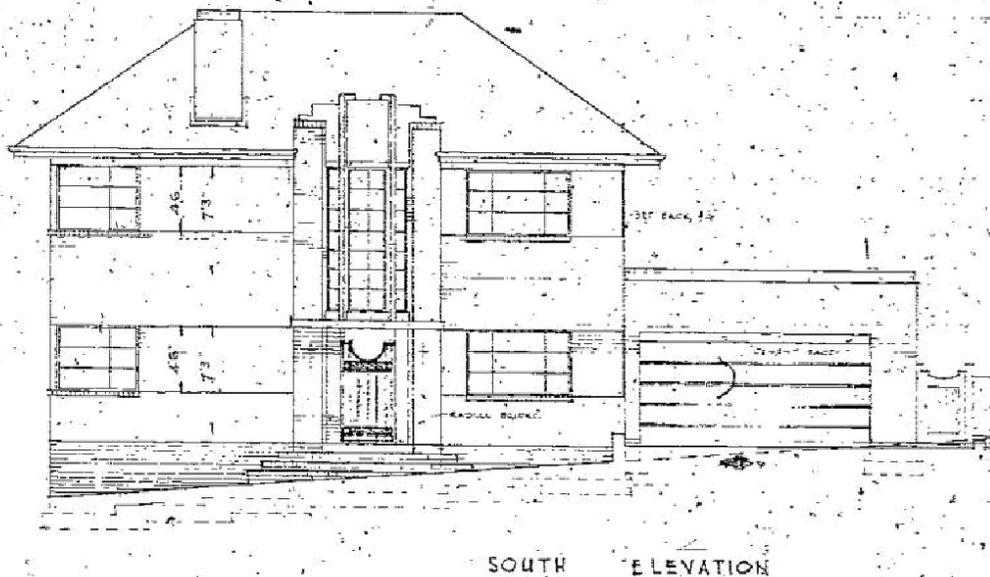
The south elevation, facing Yarrbat Avenue from the original house plans. Note the single-storey form of the garage. (Source: City of Boroondara Building Permit 10142, dated 11 August 1938)
